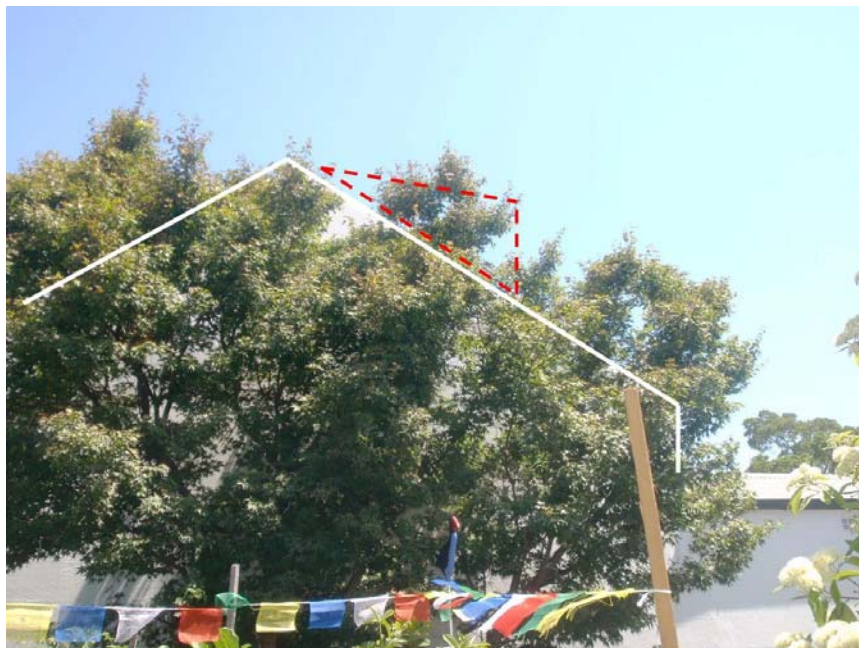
Amended envelope of rear roof extension shown in red and dashed.
